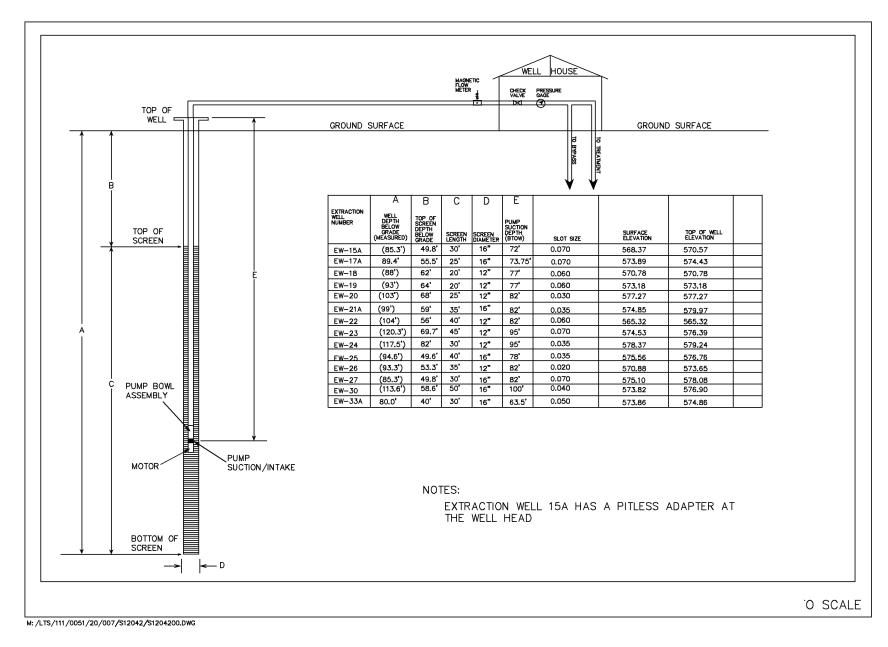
South Field Module and Waste Storage Area Extraction Well Installation Details
